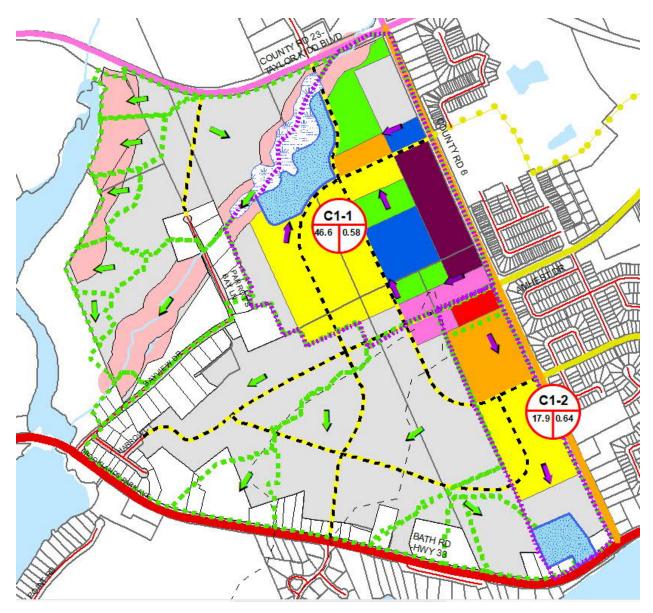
Amherstview West Secondary Plan Post-Development Sub-Catchments – 25 Year Plan
